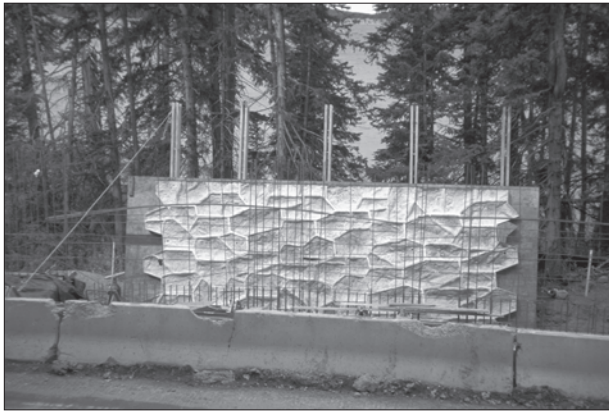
Formwork and foundation for simulated stone retaining wall, Yellowstone National Park. (Davis 1996)
